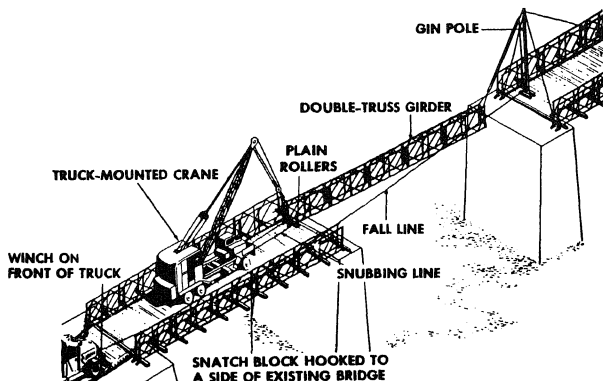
Launching a double-truss girder with gin pole and snubbing tackle.
